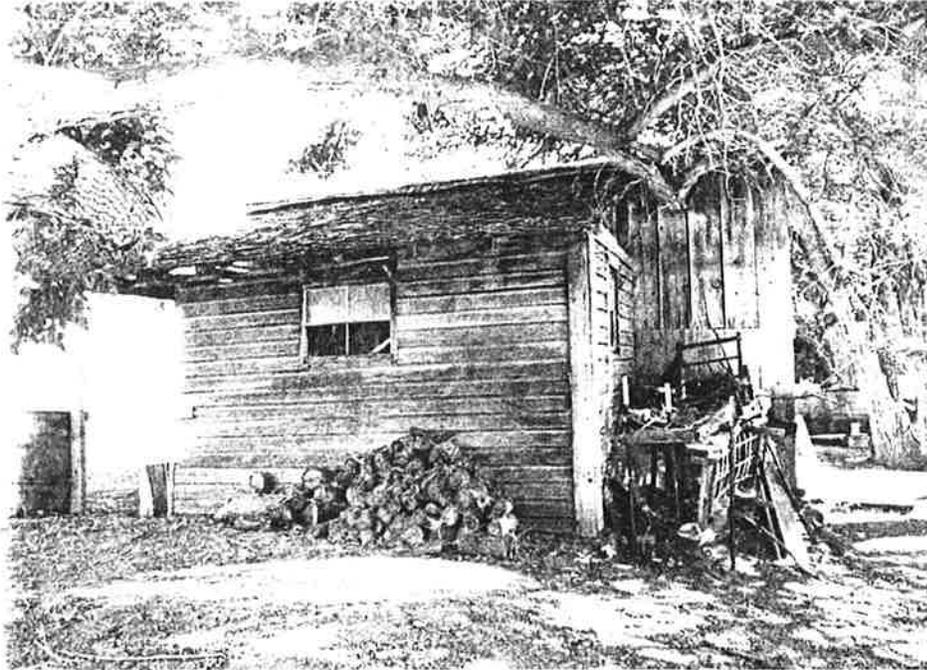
Morrison garage/shop, north side of shed addition with firewood and patio furniture piled against the walls of the building. (Neg. R1-16)
